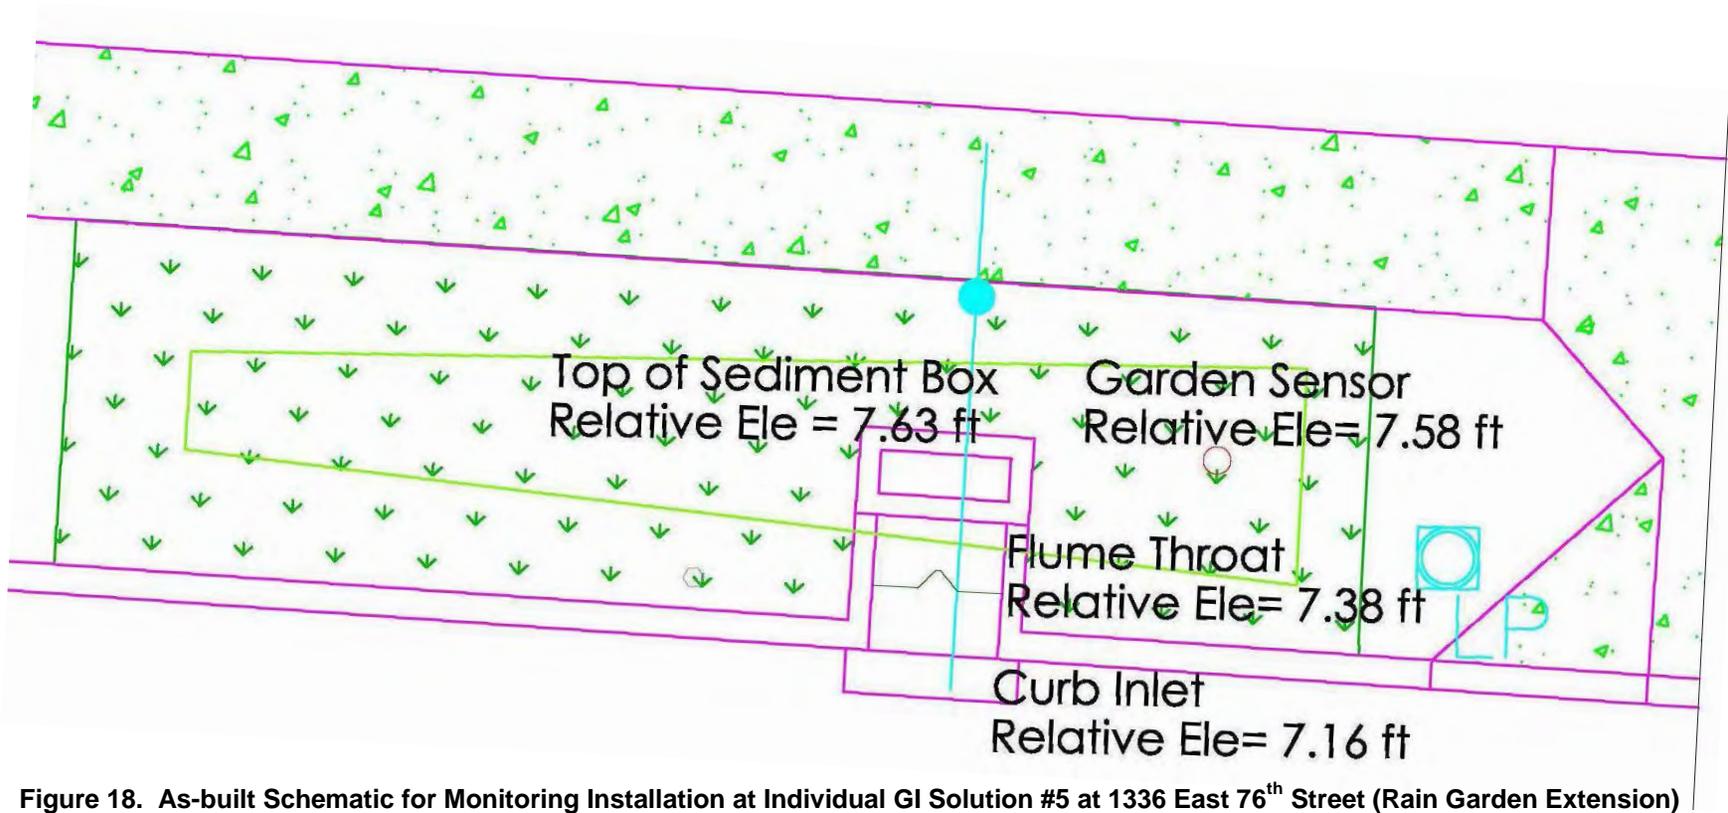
As-built Schematic for Monitoring Installation at Individual GI Solution #5 at 1336 East 76th Street (Rain Garden Extension)
